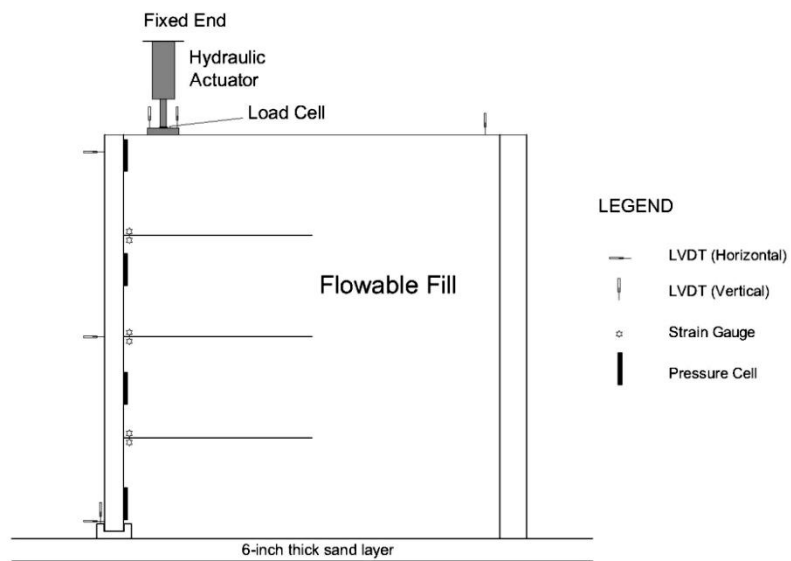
Instrumentation of the laboratory test of CLSM bridge abutment.
